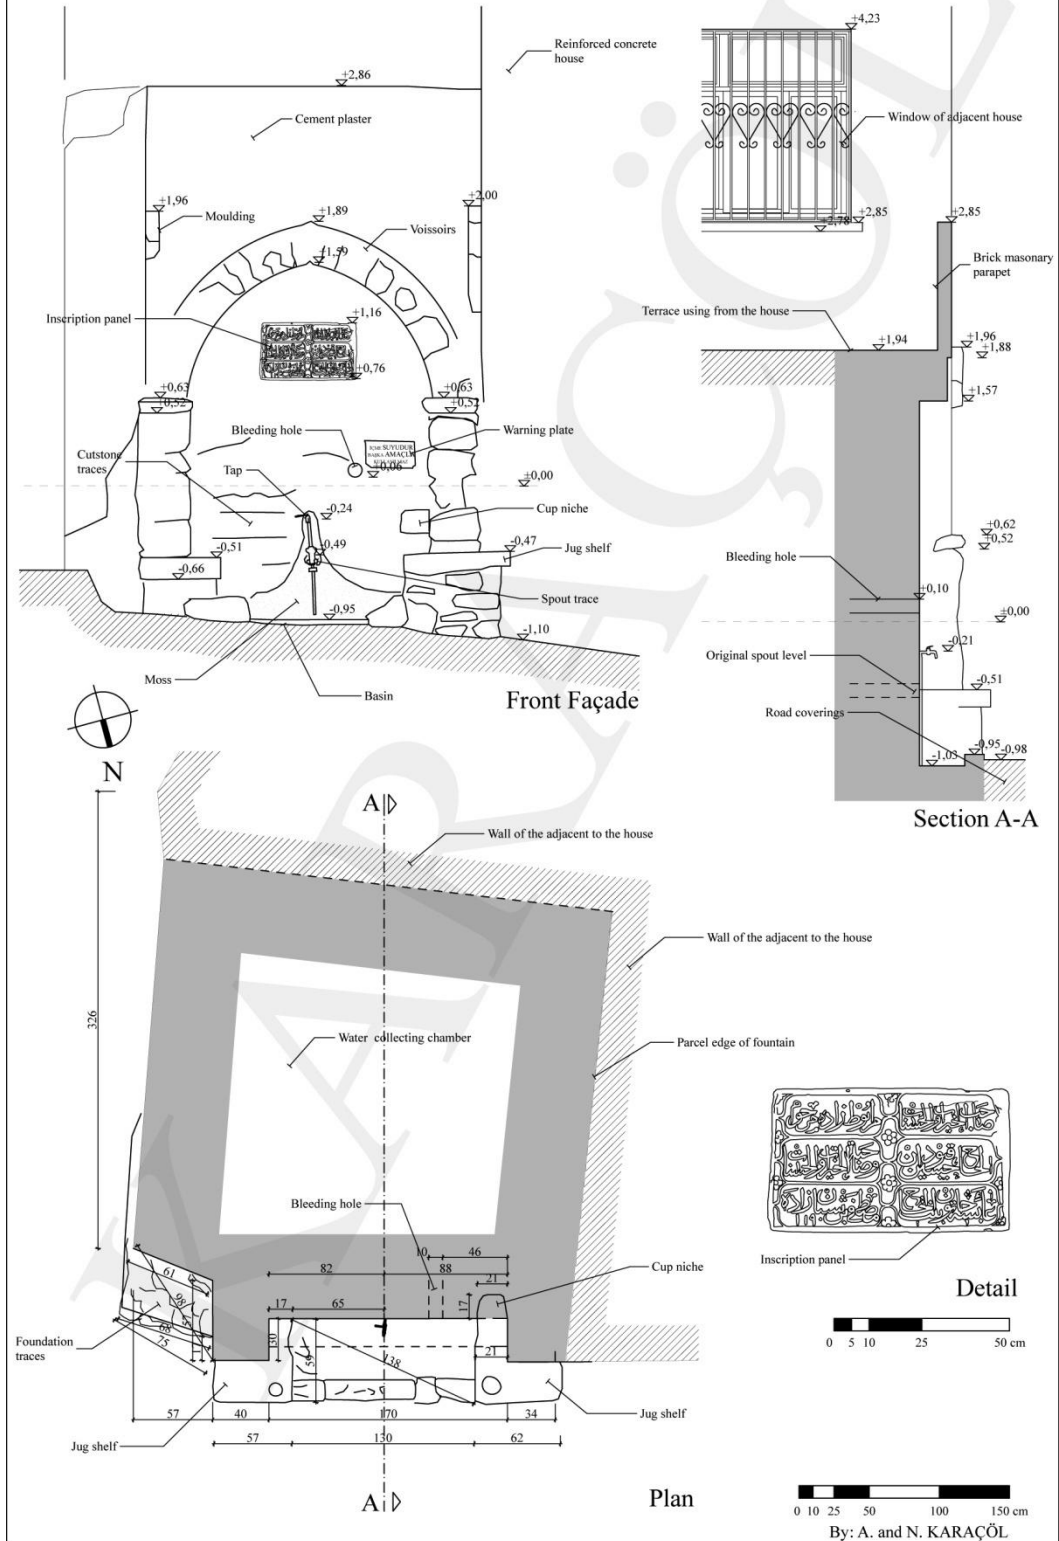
Murabutzade Fountain front façade, section, plan and detail drawings
